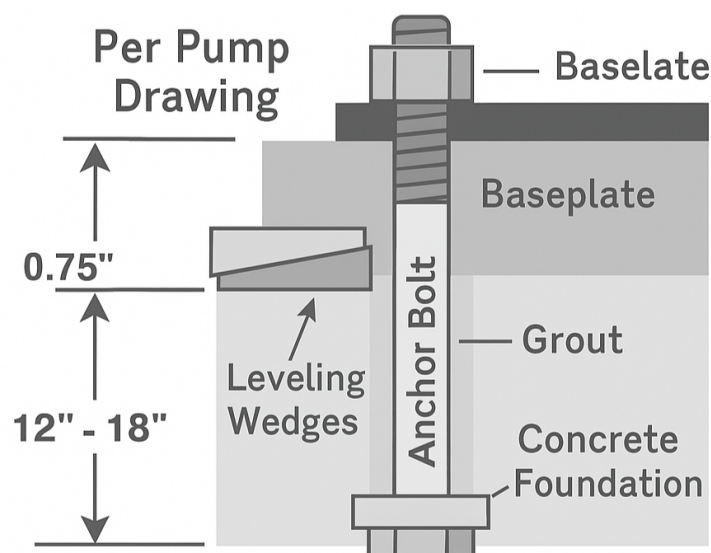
Typical Anchor Bolt Arrangement (Sleeve Type)
